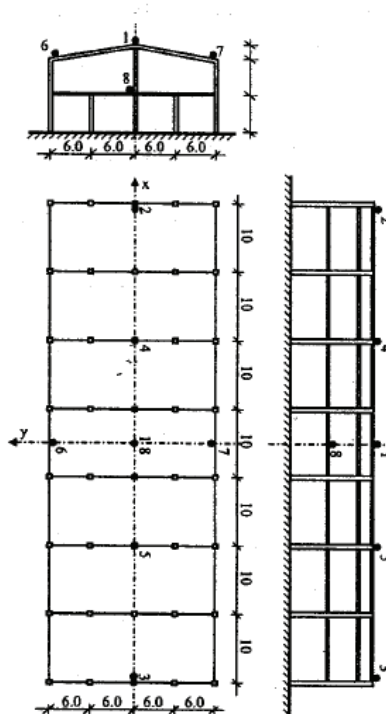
Arrangement of measuring points for a two storey structure without walls
